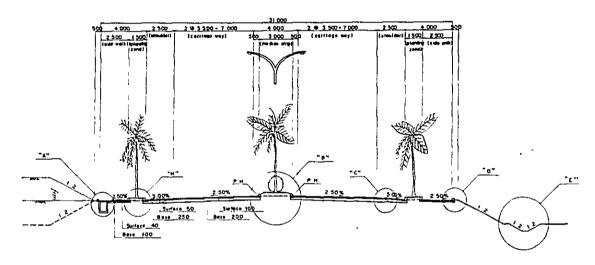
Typical Cross Section of T-1 Arterial Tourism Road
